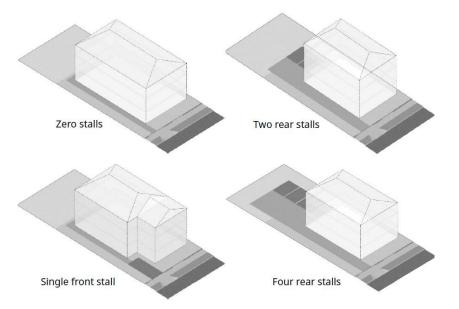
Impacts to building area and siting from on-site parking requirements
